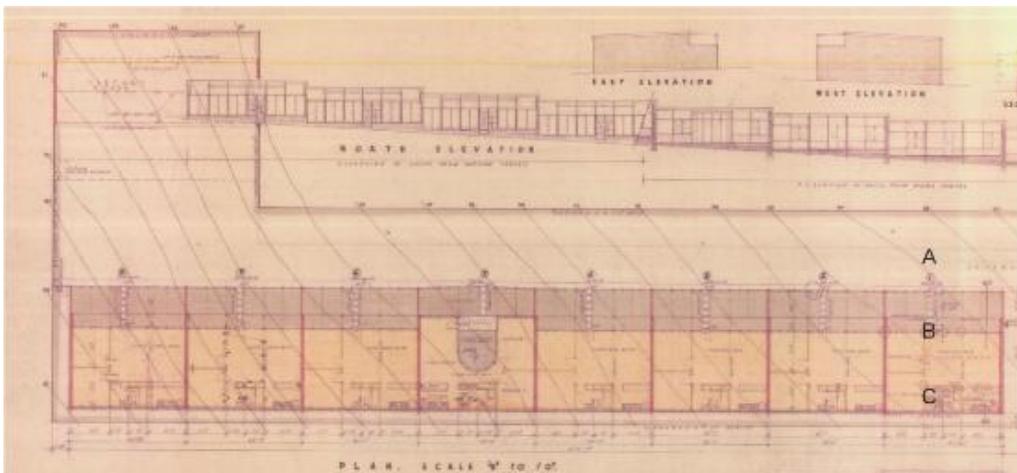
Partial site plan and elevation for the Romberg designed flats for ‘Yarralands’. (Source: Angelucci, 2014)
